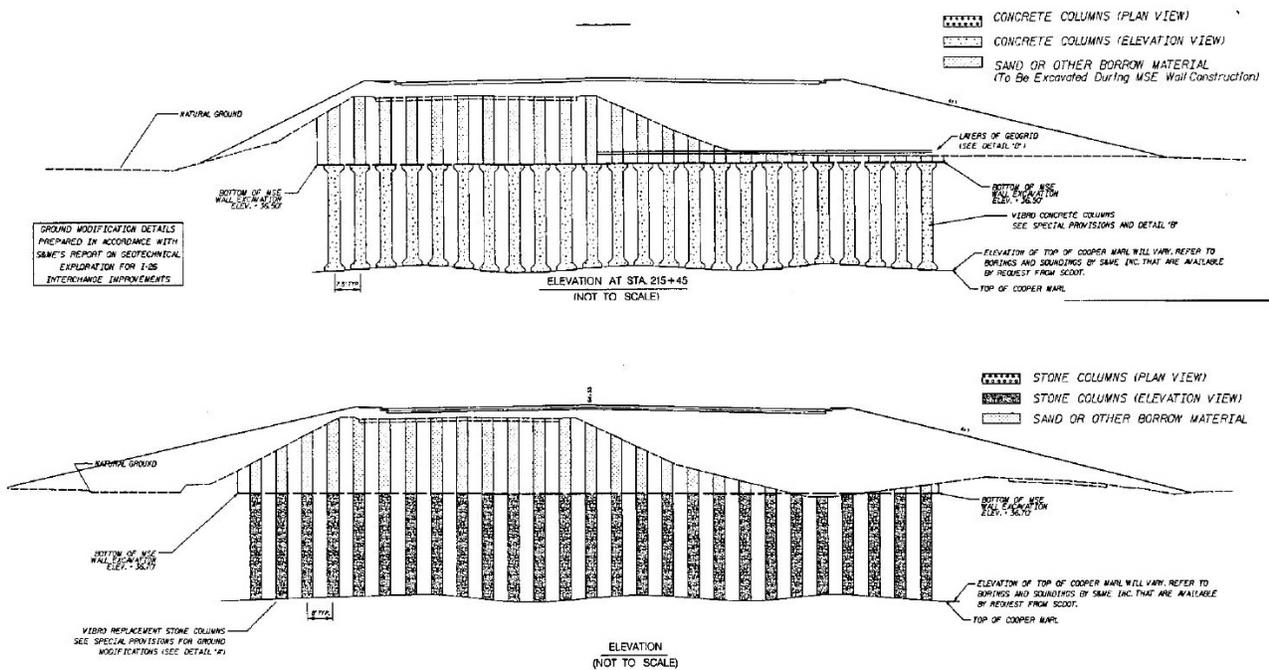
Cross Section of Vibro Stone Columns and Vibro Concrete Columns
